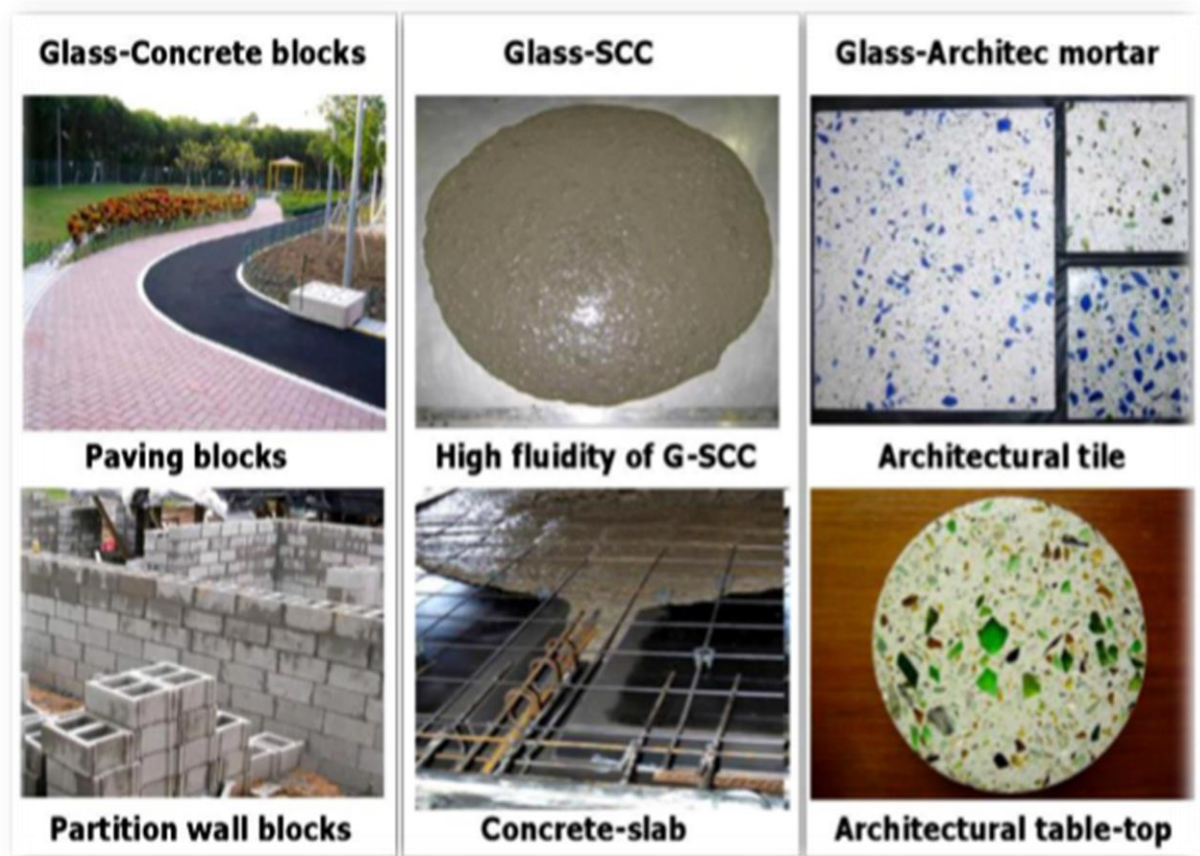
Potential glass of concrete products in construction industries (Source: Ling and Poon, 2011).
